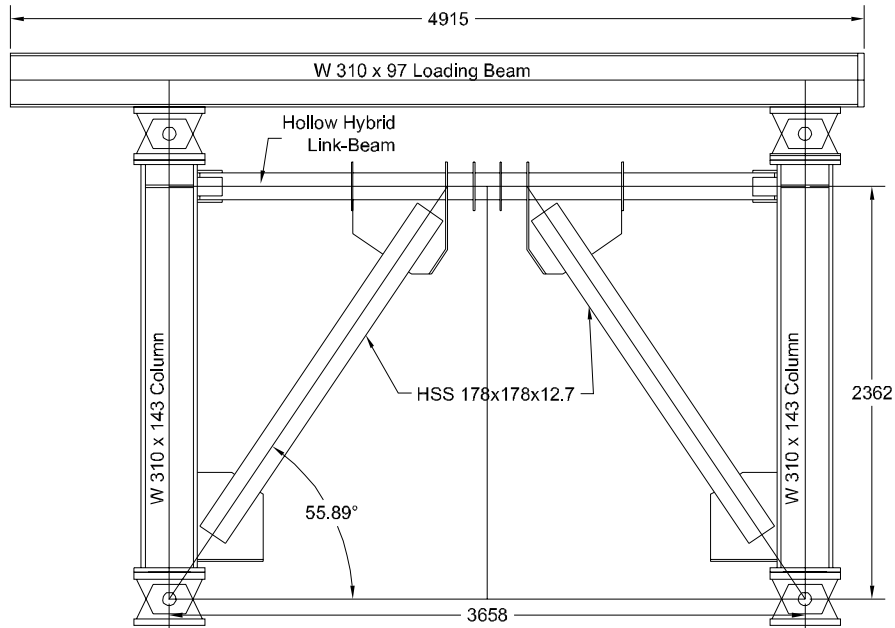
Test Specimen Dimensions and Member Sizes
